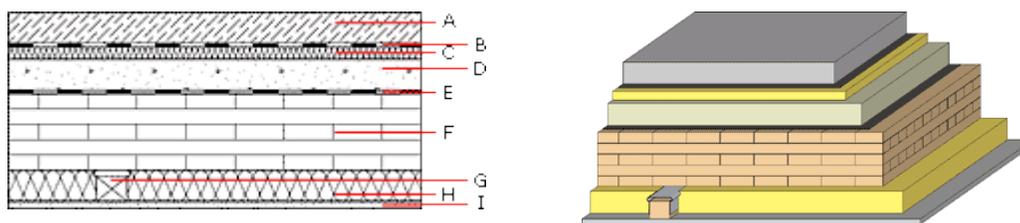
Cross-section of standard configuration and 3D view of compartment floor (dataholz.com 2017).
